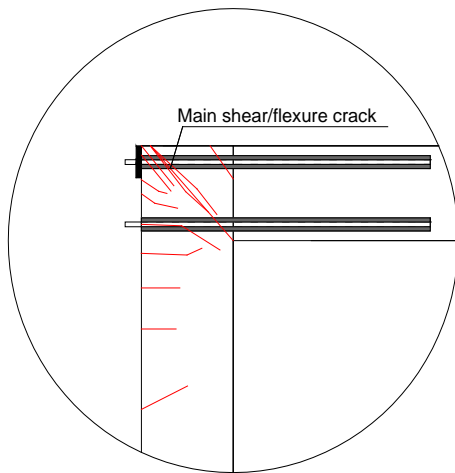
Crack pattern of a joint of an element of specimen "S.5 H.D."
